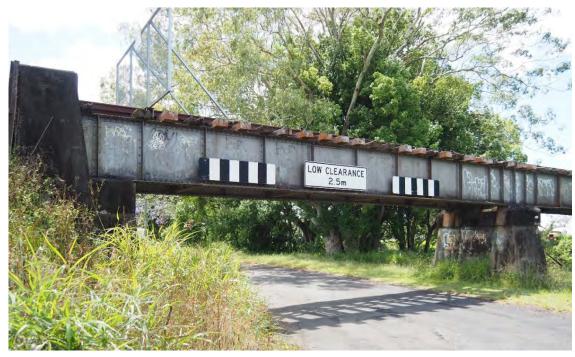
Crane Street - East elevation, typical condition (Source: FBE)
